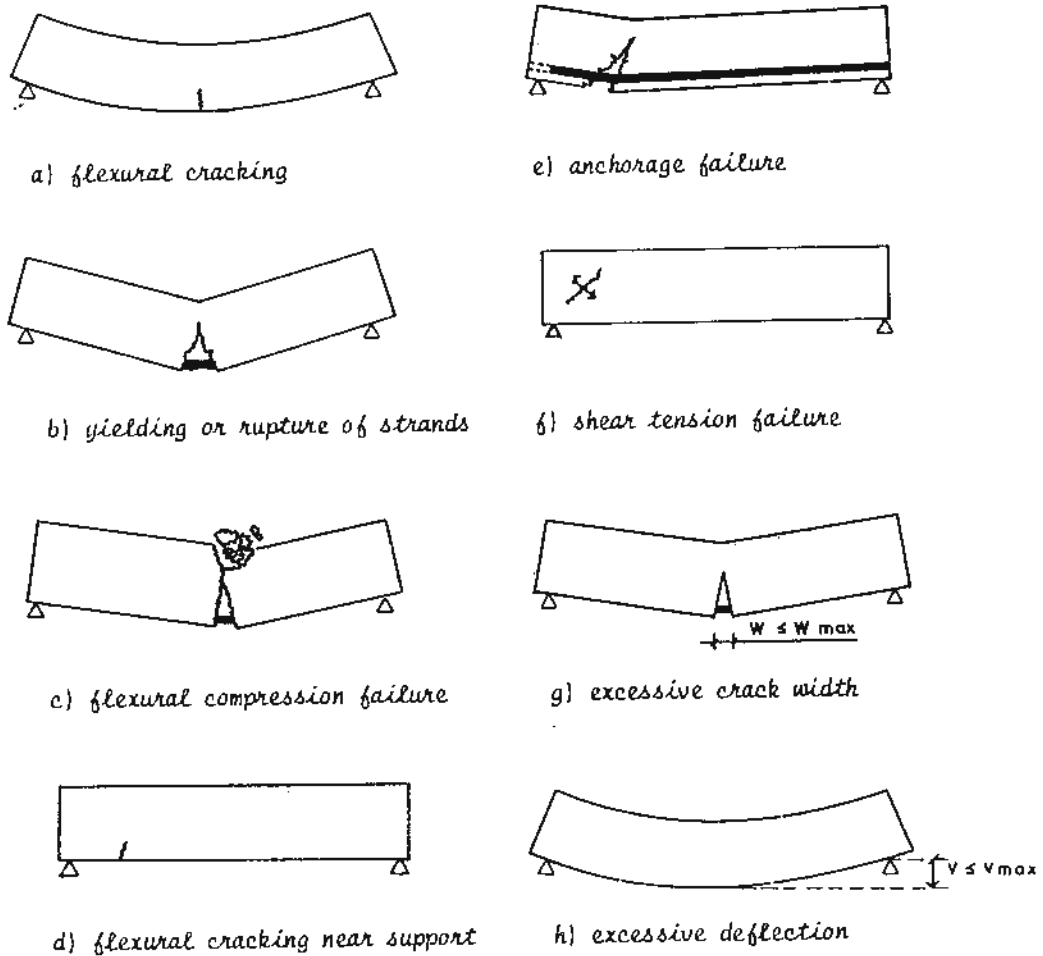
Relevant limit states for a prestressed hollow core slab.
